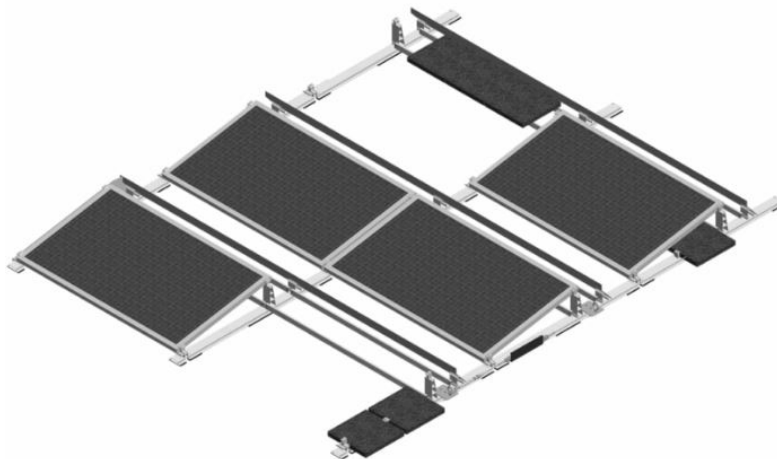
Sketch of the substructure installation on the roof (Source: <https://www.tritec-energy.com/en/>)
